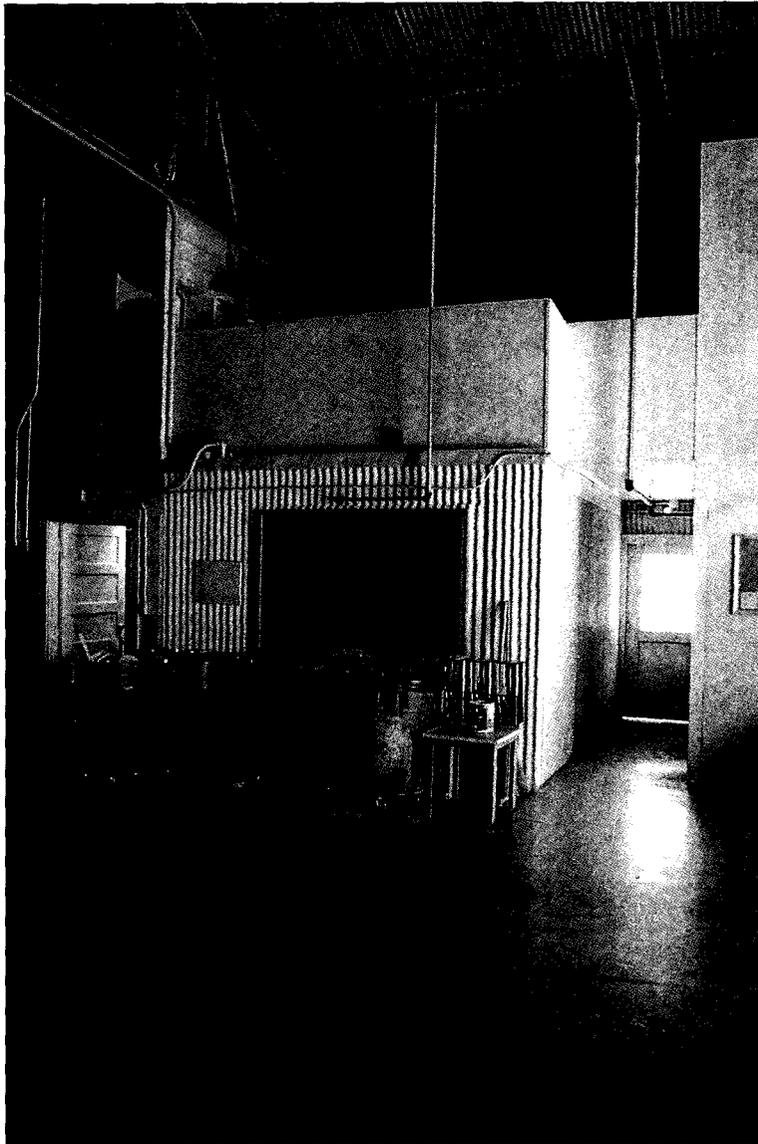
Vertical metal corrugated siding covers the walls to this storage area on the south side of the building interior, July 2005.
